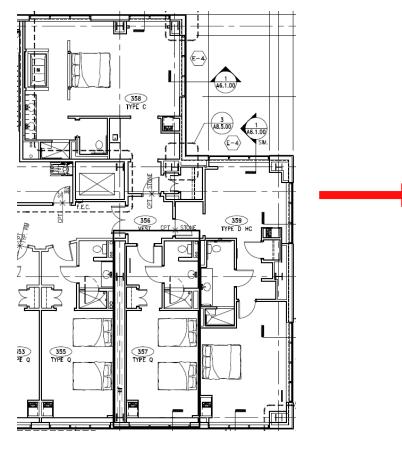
Truss Obstructing VIP Master Bedroom Drawing Courtesy of JCJ Architecture The notched section of the SAC Hotel that the master bedroom is adjacent to needed to be "squared-off" to make room for the truss and to prevent any obstructions within the bedroom. This was accomplished by shifting the master bedroom to the right to match the furthestextending exterior wall, shown below. The truss is then hidden within the bedrooms wall while maintaining the spacing of 58' between trusses per floor.
